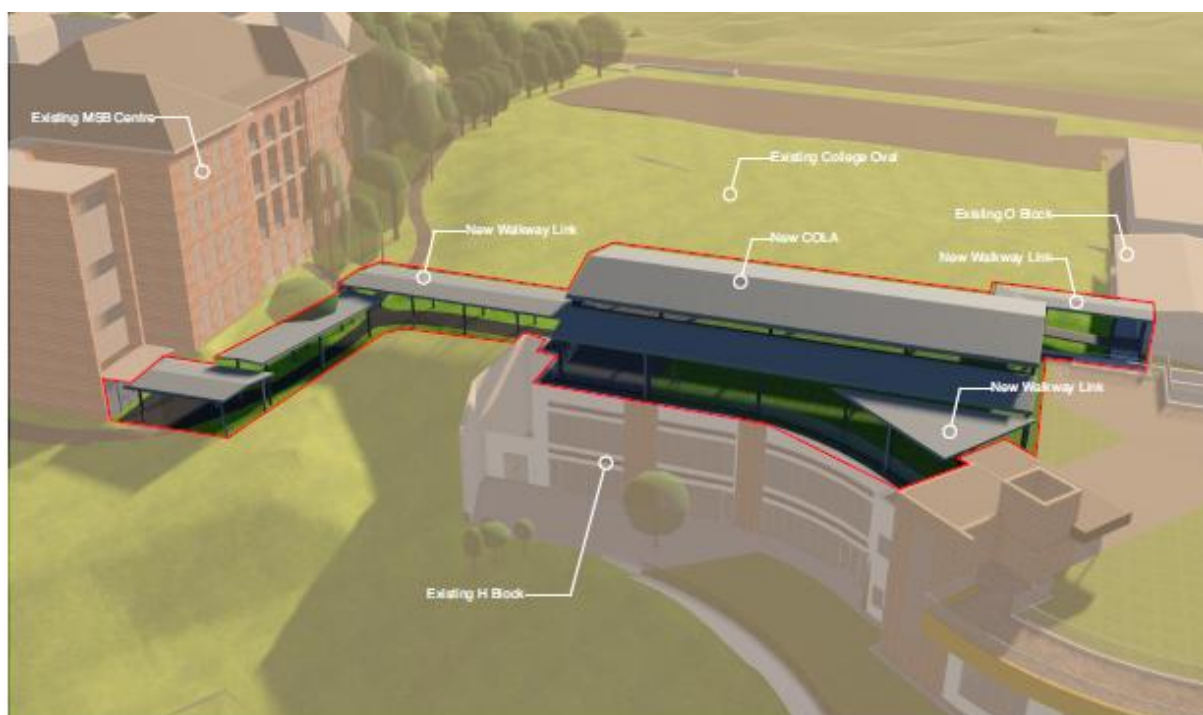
Photomontage of proposed development (Source Stanton Dahl Architects)
